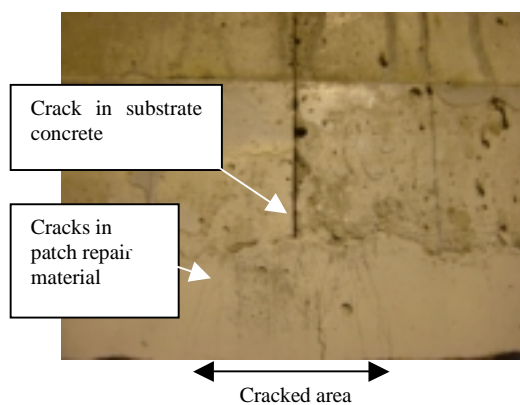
Crack pattern of repaired specimen (with artificial crack and un-bonded part)
